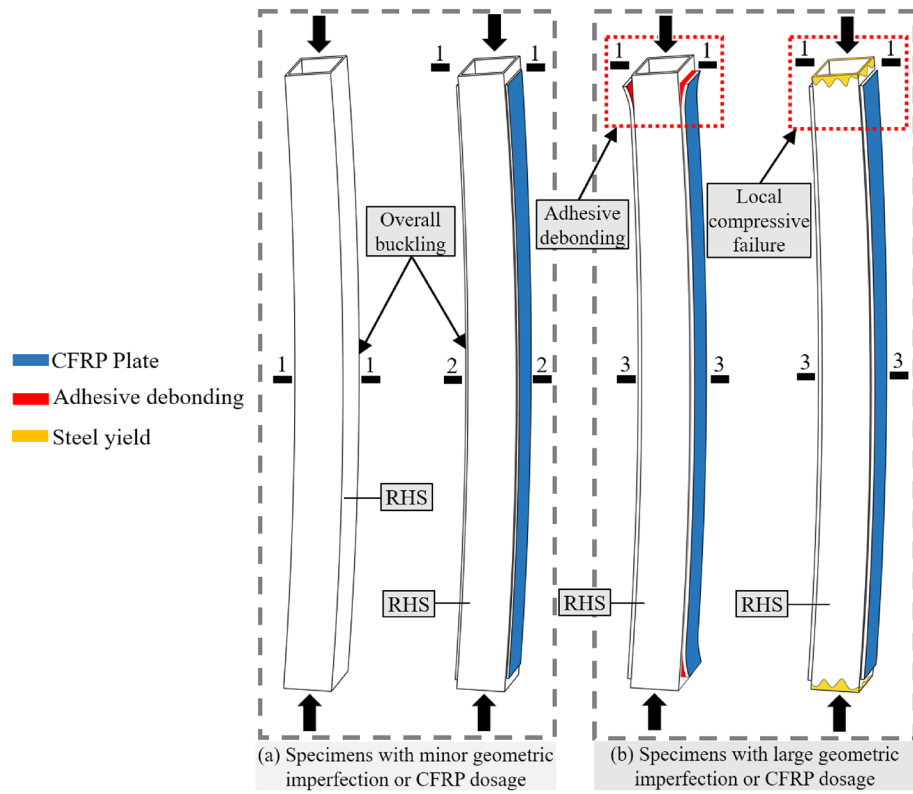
Typical failure modes of the CFRP plate-reinforced equal-thickness square hollow section. (Section 1-1: steel hollow section; Section 2-2: steel hollow section strengthened with thin CFRP layer; Section 3-3: steel hollow section strengthened with thick CFRP layer).
